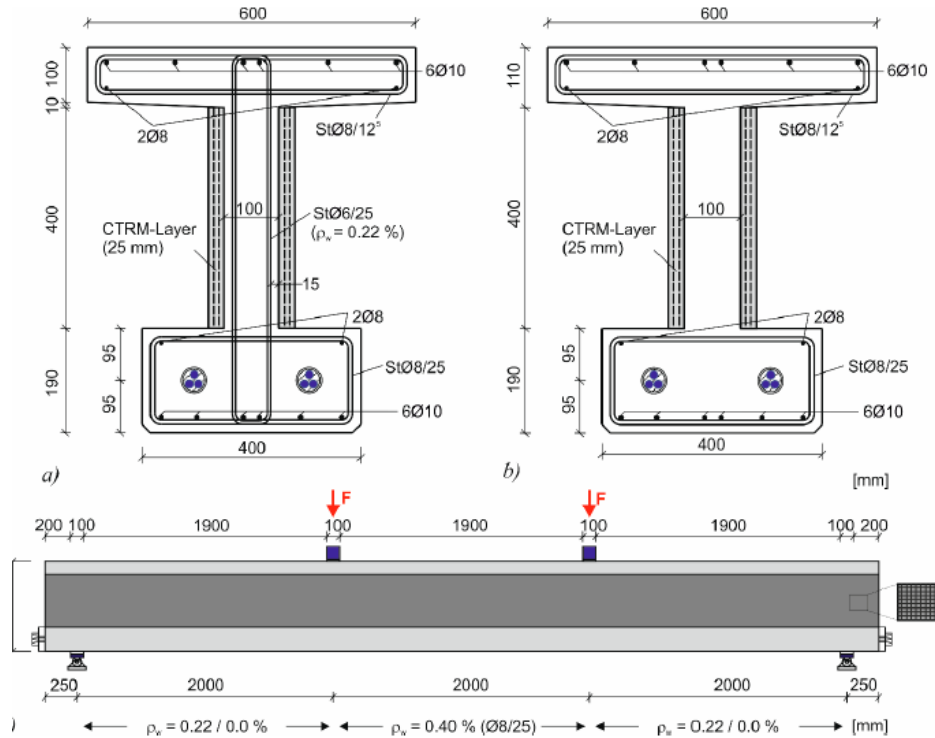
Shear strengthening of prestressed I girders with CTRM [40].
